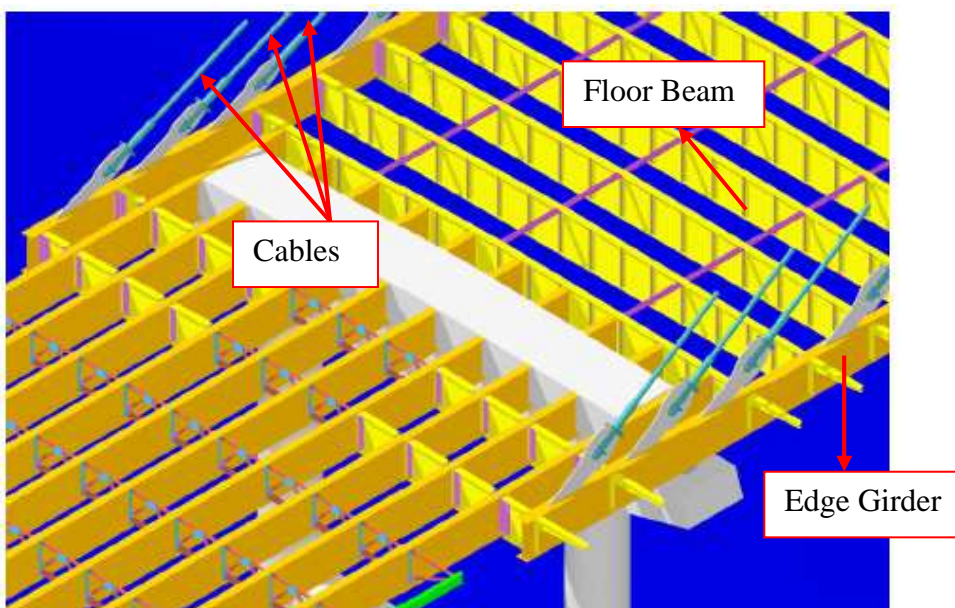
Structural System of Cable Stayed Bridge (Abrahams et al.)
